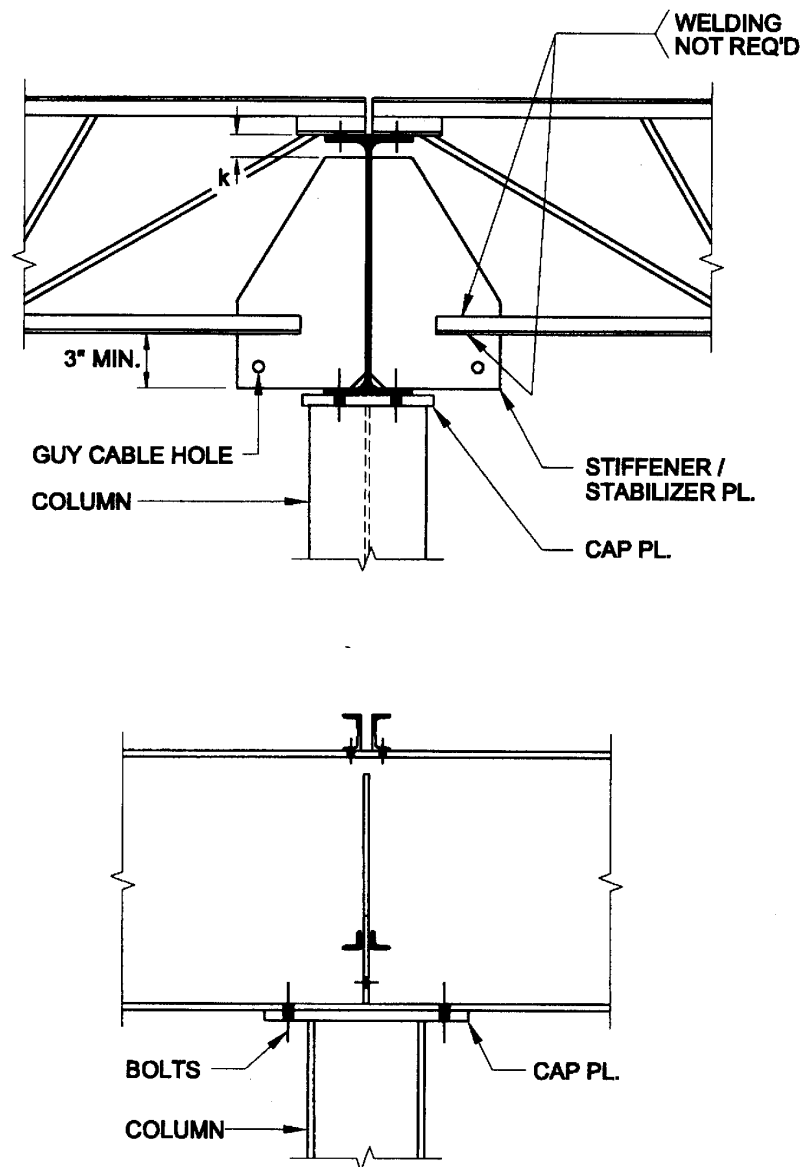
Beam framing continuously over column top, stability provided with stiffener plates, joist-chord extensions located above column top not welded.
